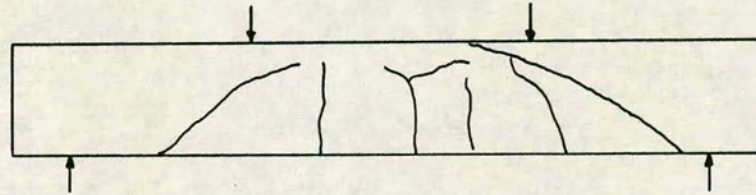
Web-Shear Crack in a Partially Prestressed Concrete Beam
